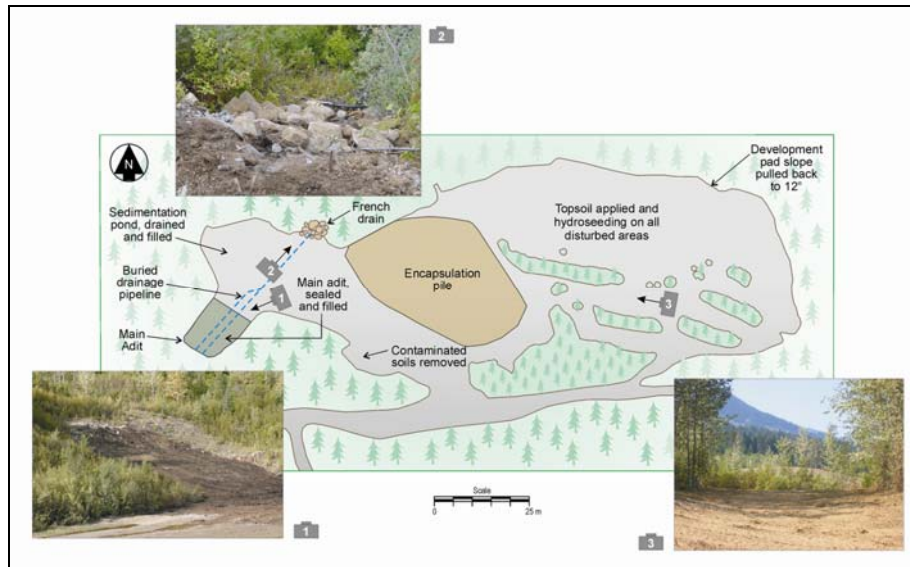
Trout Lake Main Portal Area – Reclaimed Site
